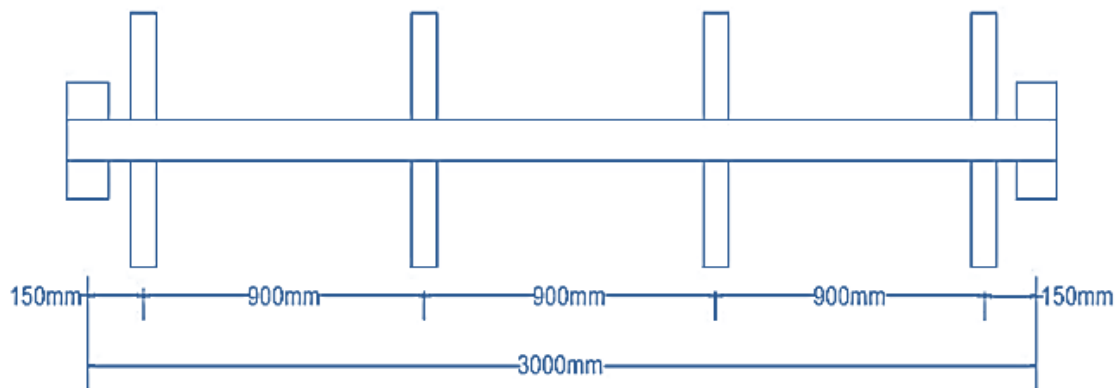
Specimen B3-R0 strengthening arrangement .
